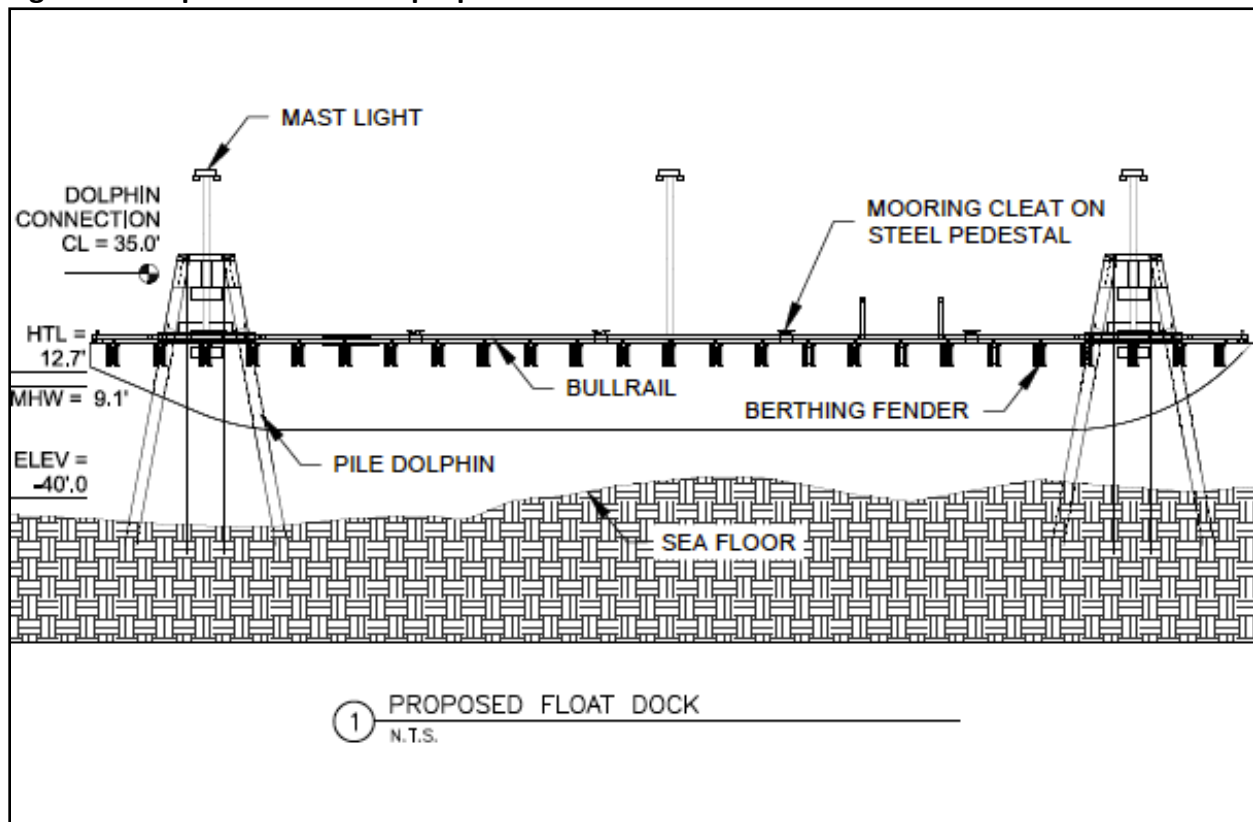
Proposed GPIP Multipurpose Dock Site Plan.
